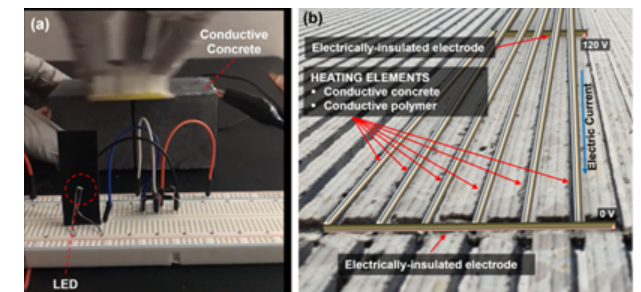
(a) Conductive concrete developed at Pitt powers an LED [14]. (b) Vision for self-heating concrete pavement with surface-mounted heating elements partially filling the grooves.
